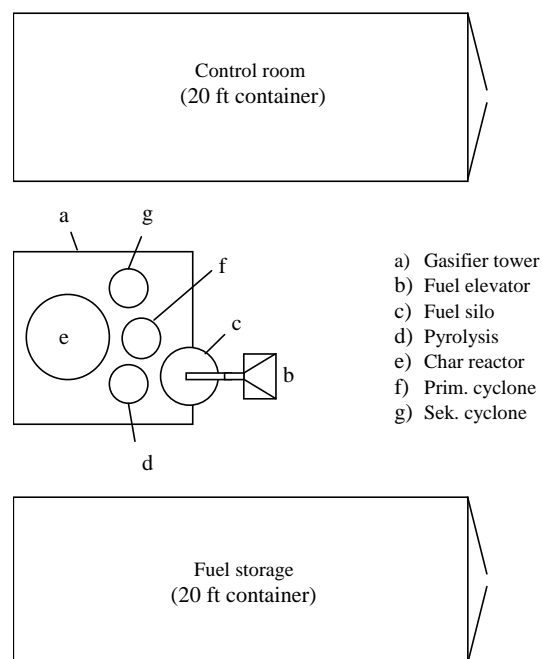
500 kW LT-CFB plant at DTU, plan view.
